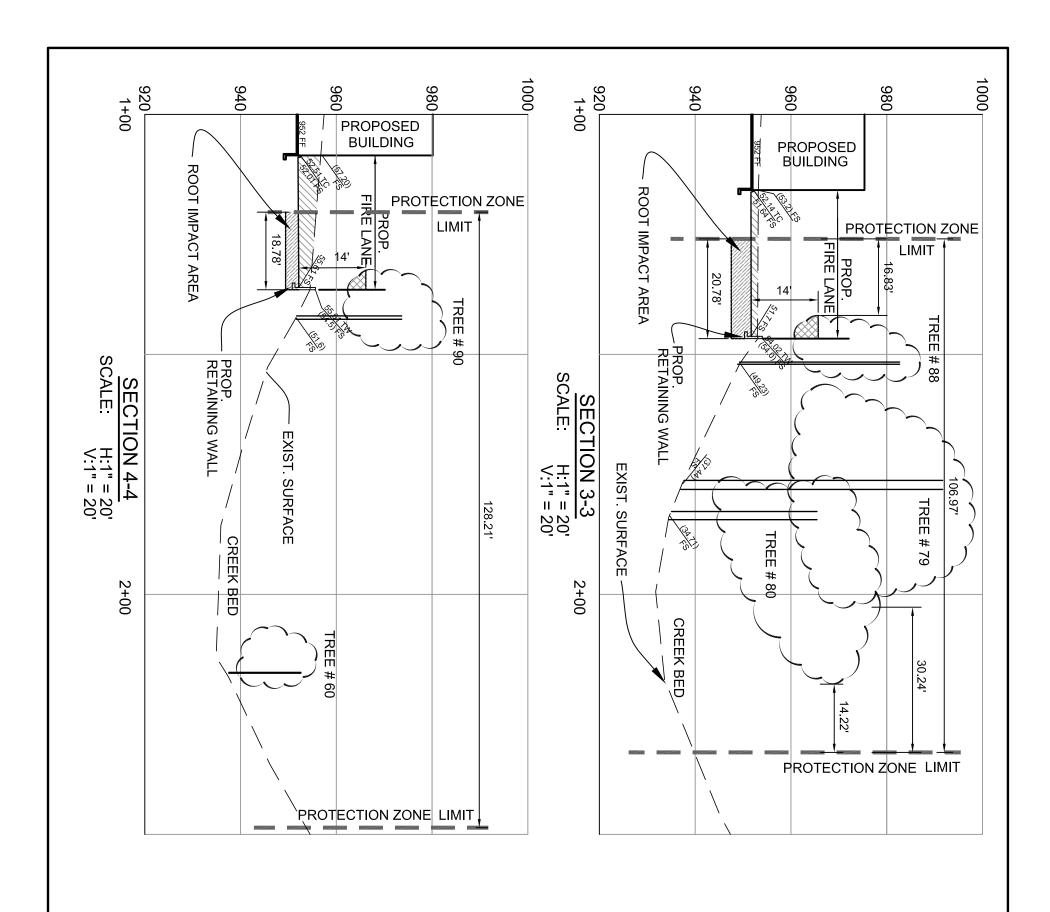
of OAK TREE CROSS-SECTIONS VILLAGE AT CALABASAS
